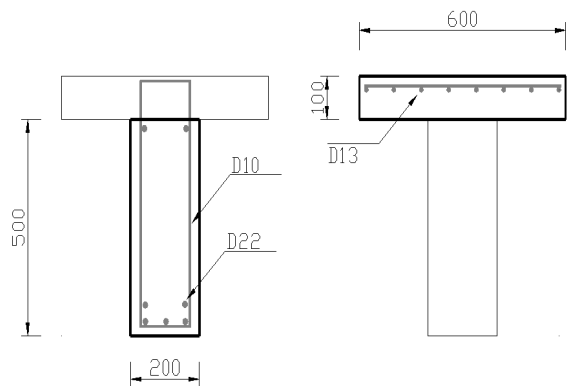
Section and reinforcement arrangement of the test specimen (unit: mm)
